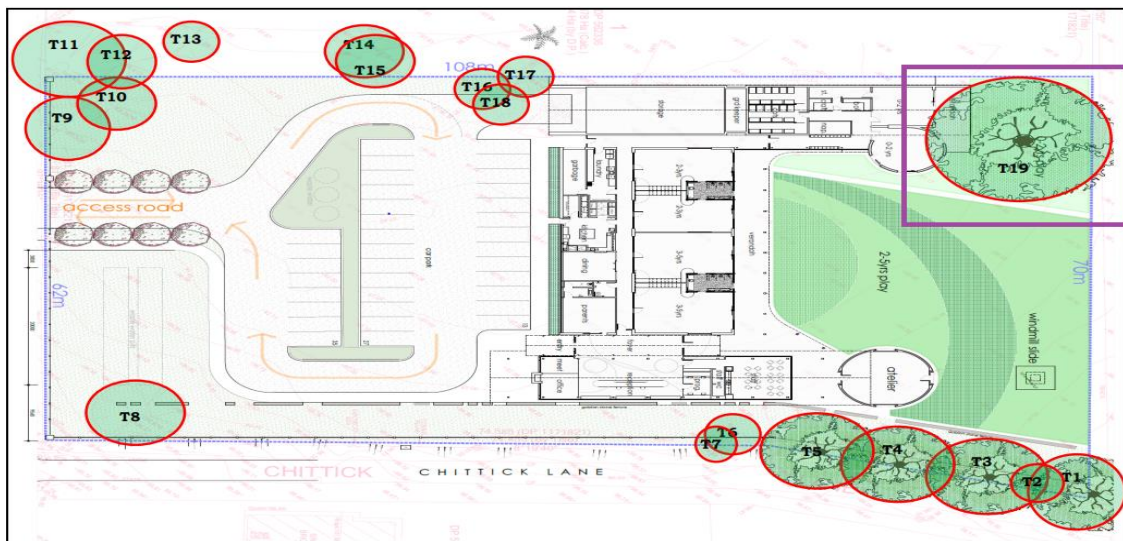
Site plan of the proposed development and location of all existing trees within the subject site. Trees sought for removal are identified as ‘T14’ and ‘T19.’
